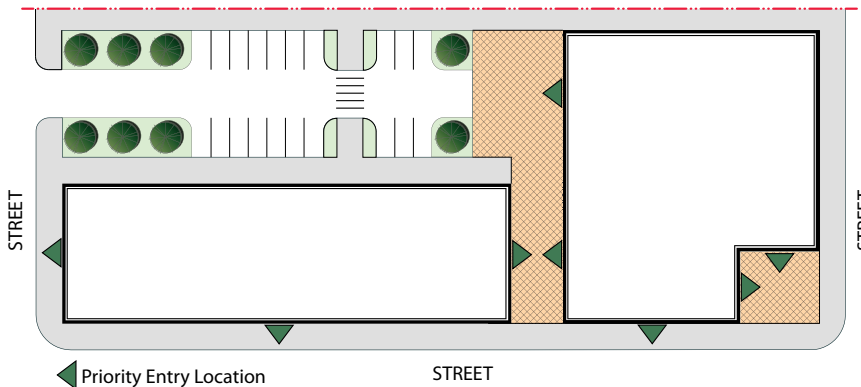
Orient a building's primary entry to face a street. Orienting a primary entry to a public plaza or other prominent public space is also acceptable.
